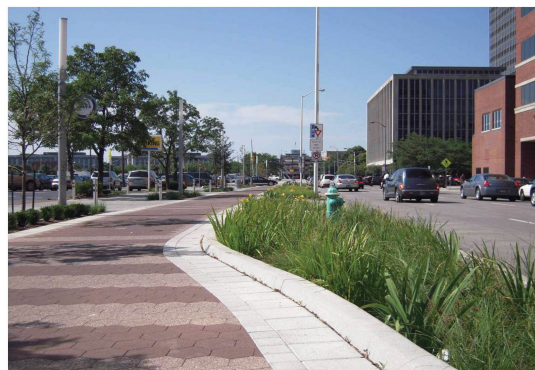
Photos Above Are Examples of Streetscape Improvements
